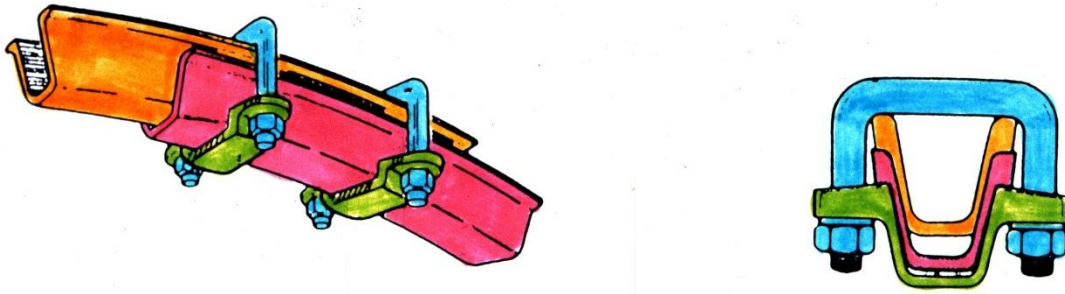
Assembly of a sliding joint in a top hat section steel set.
